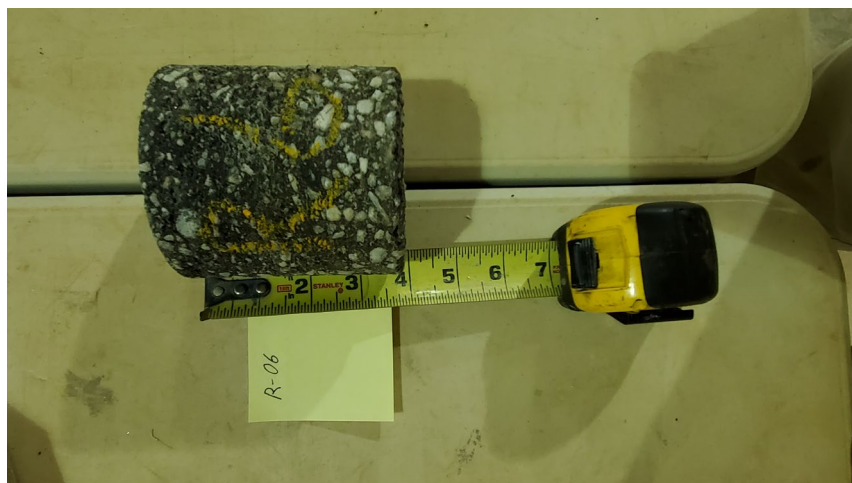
Core at R-06 (Core oriented with asphalt surface to the left)
